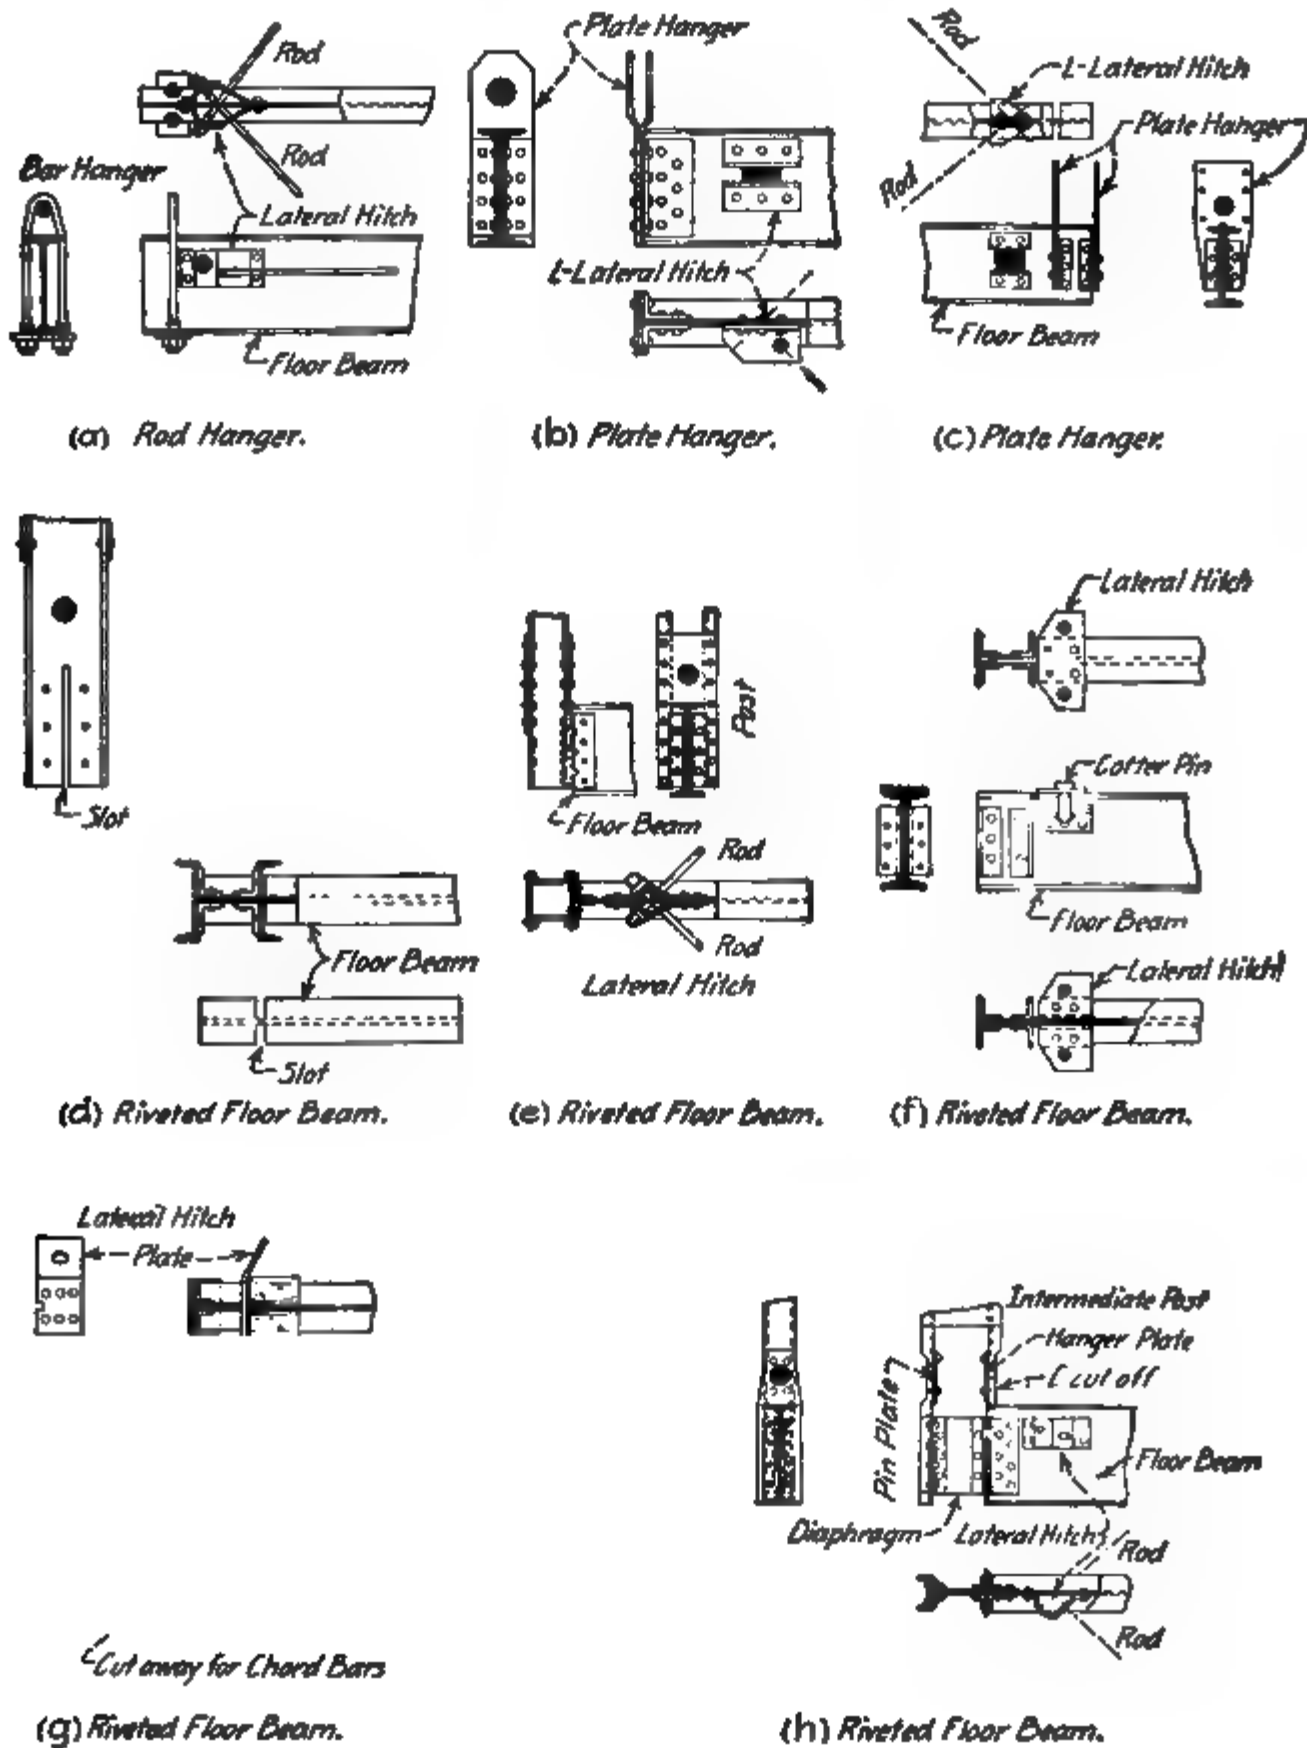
FLOORBEAM CONNECTIONS FOR HIGHWAY BRIDGES.
